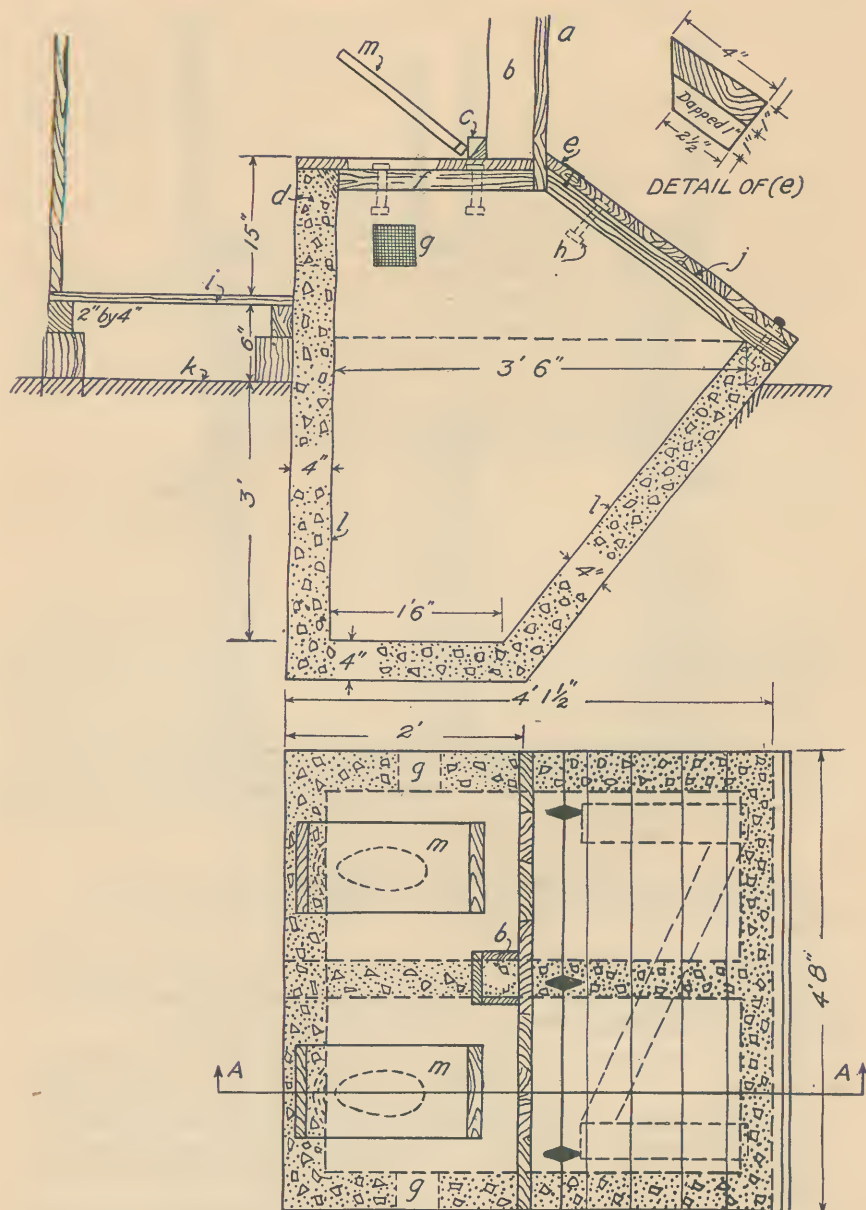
Plan and elevation of concrete vault privy. (a) Back wall of house; (b) vent, 4 inches square, inside house, screened at bottom; (c) No. 24 gauge galvanized-iron hinge; (d) concrete section in front of hole cut to 2 inches; (e) 2 by 4 inch timber extends 1 inch over walls; (f) 2 by 4 inch timber; (g) vent, 4 inches in diameter; (h) $\frac{3}{4}$ -inch anchor bolts, 8 inches long; (i) house floor; (j) door to vault, should be waterproof; (k) ground line; (l) inside surface of vault finished water-tight with neat cement; (m, m) seats 12 by 18 inches. Dimensions are approximate and may be varied.
